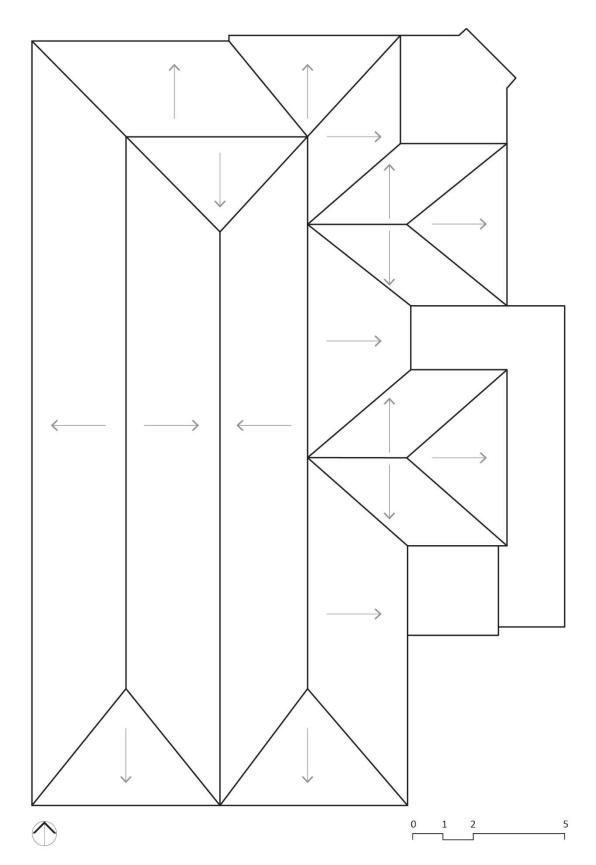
Roof plan of the Bondi Beach Post Office; north is to the top of the image
